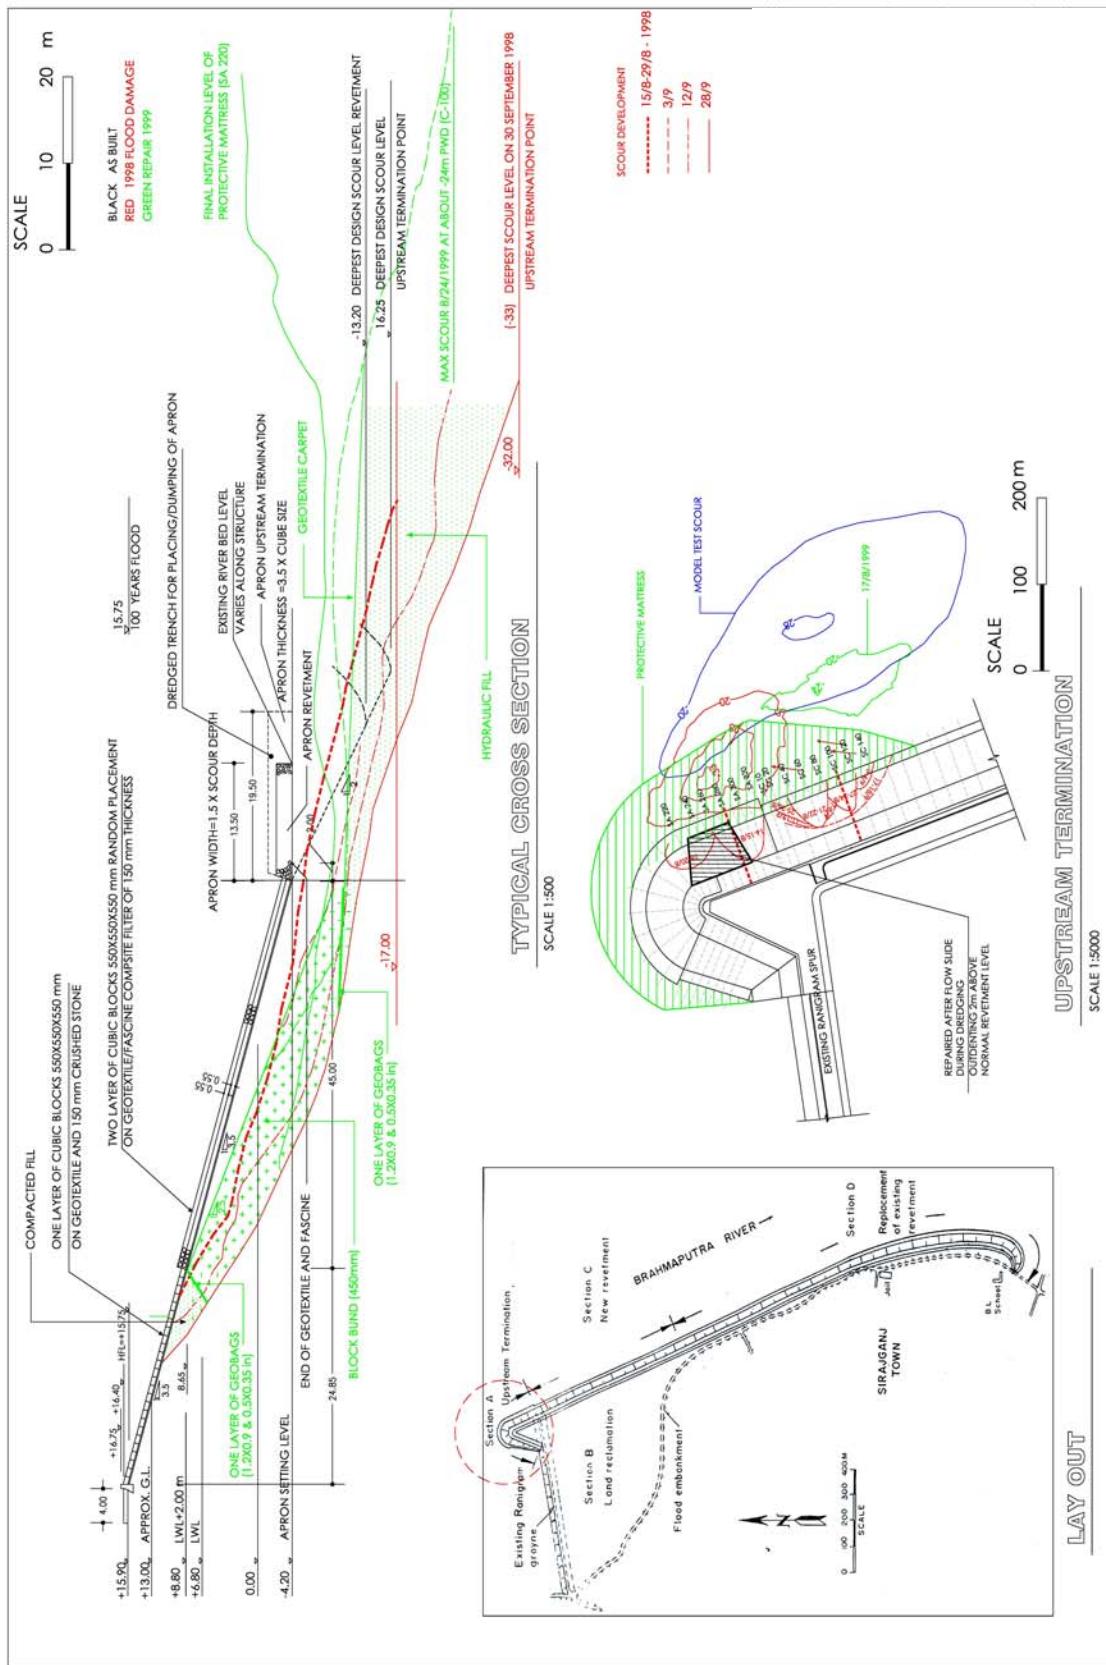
Typical cross-section and layout of Sirajganj hard point.
